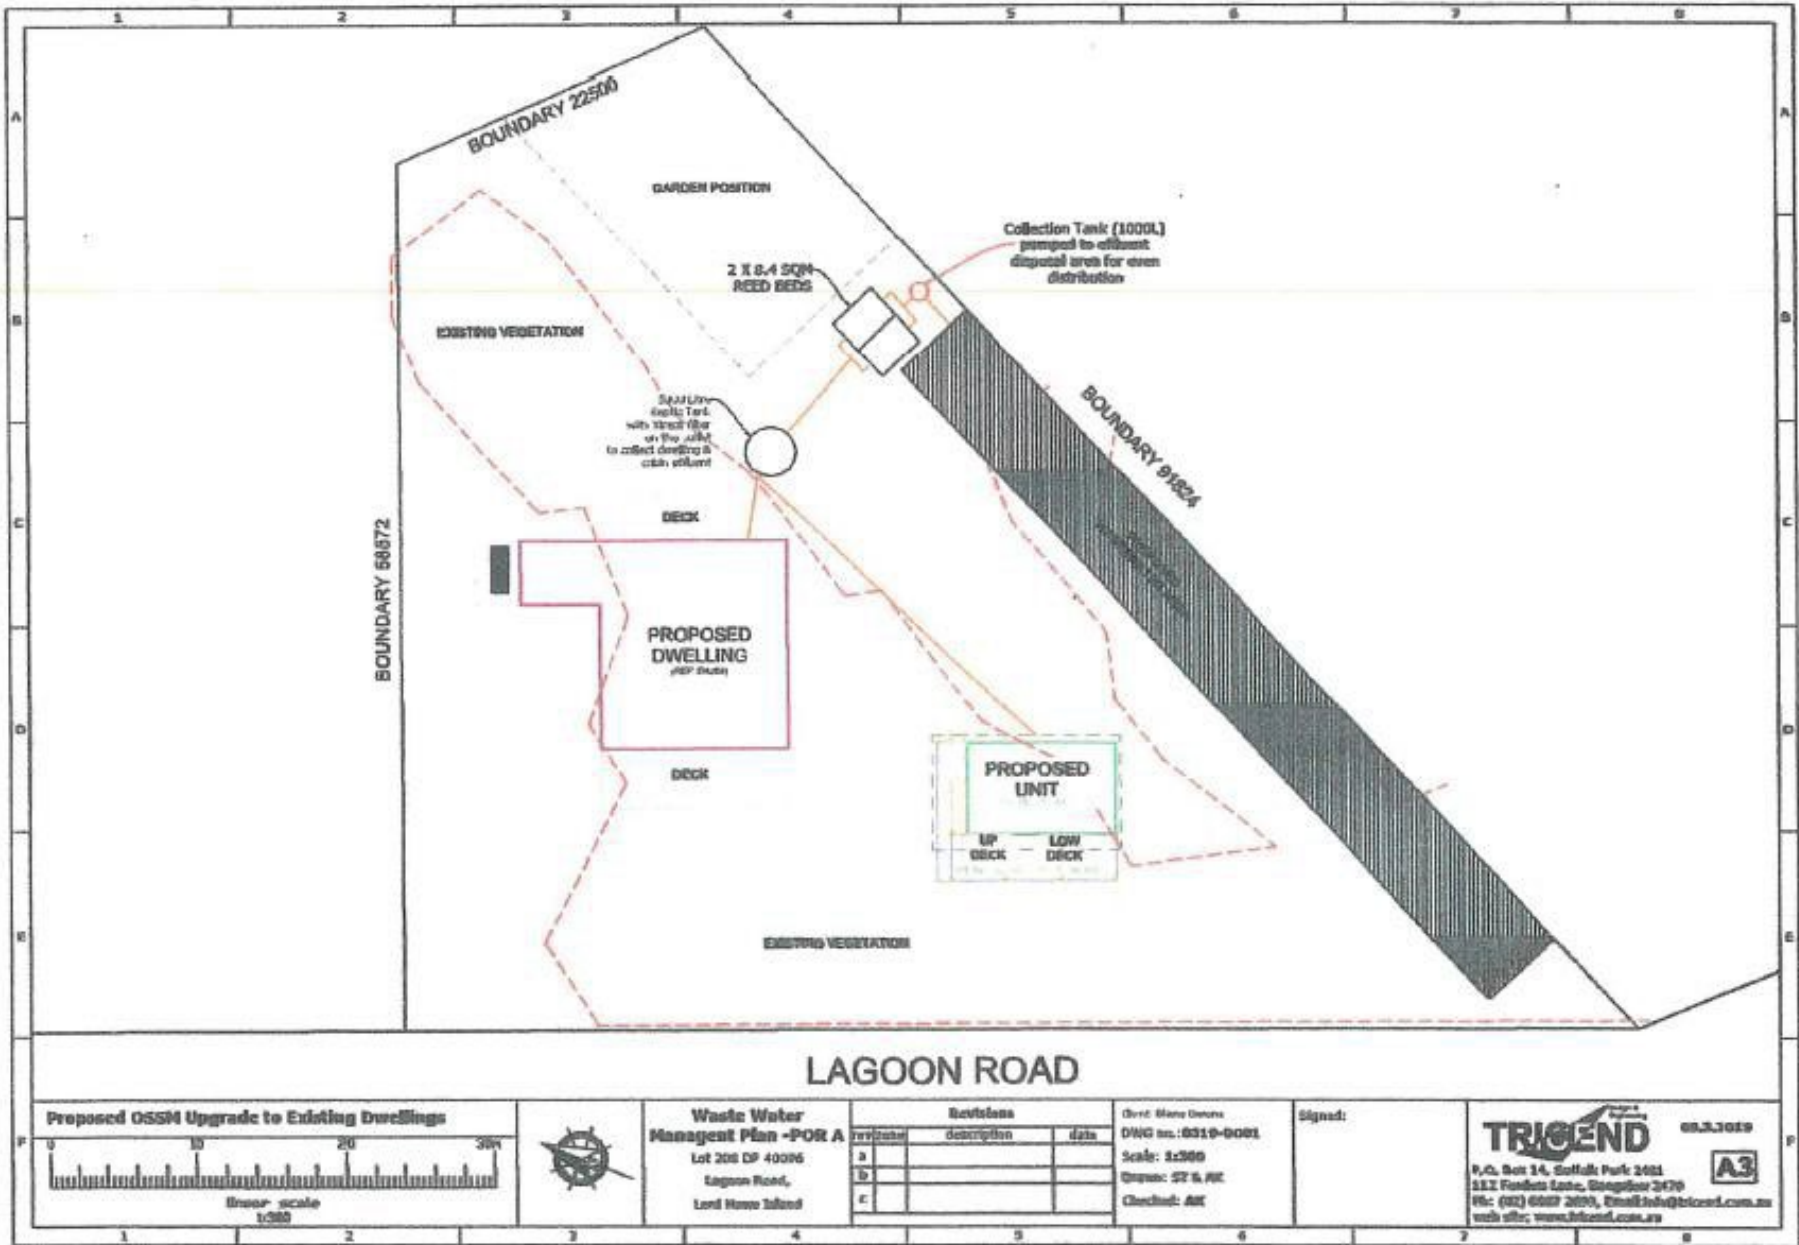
Applicant's submitted Waste Water Management Site Plan Proposed Lot A
